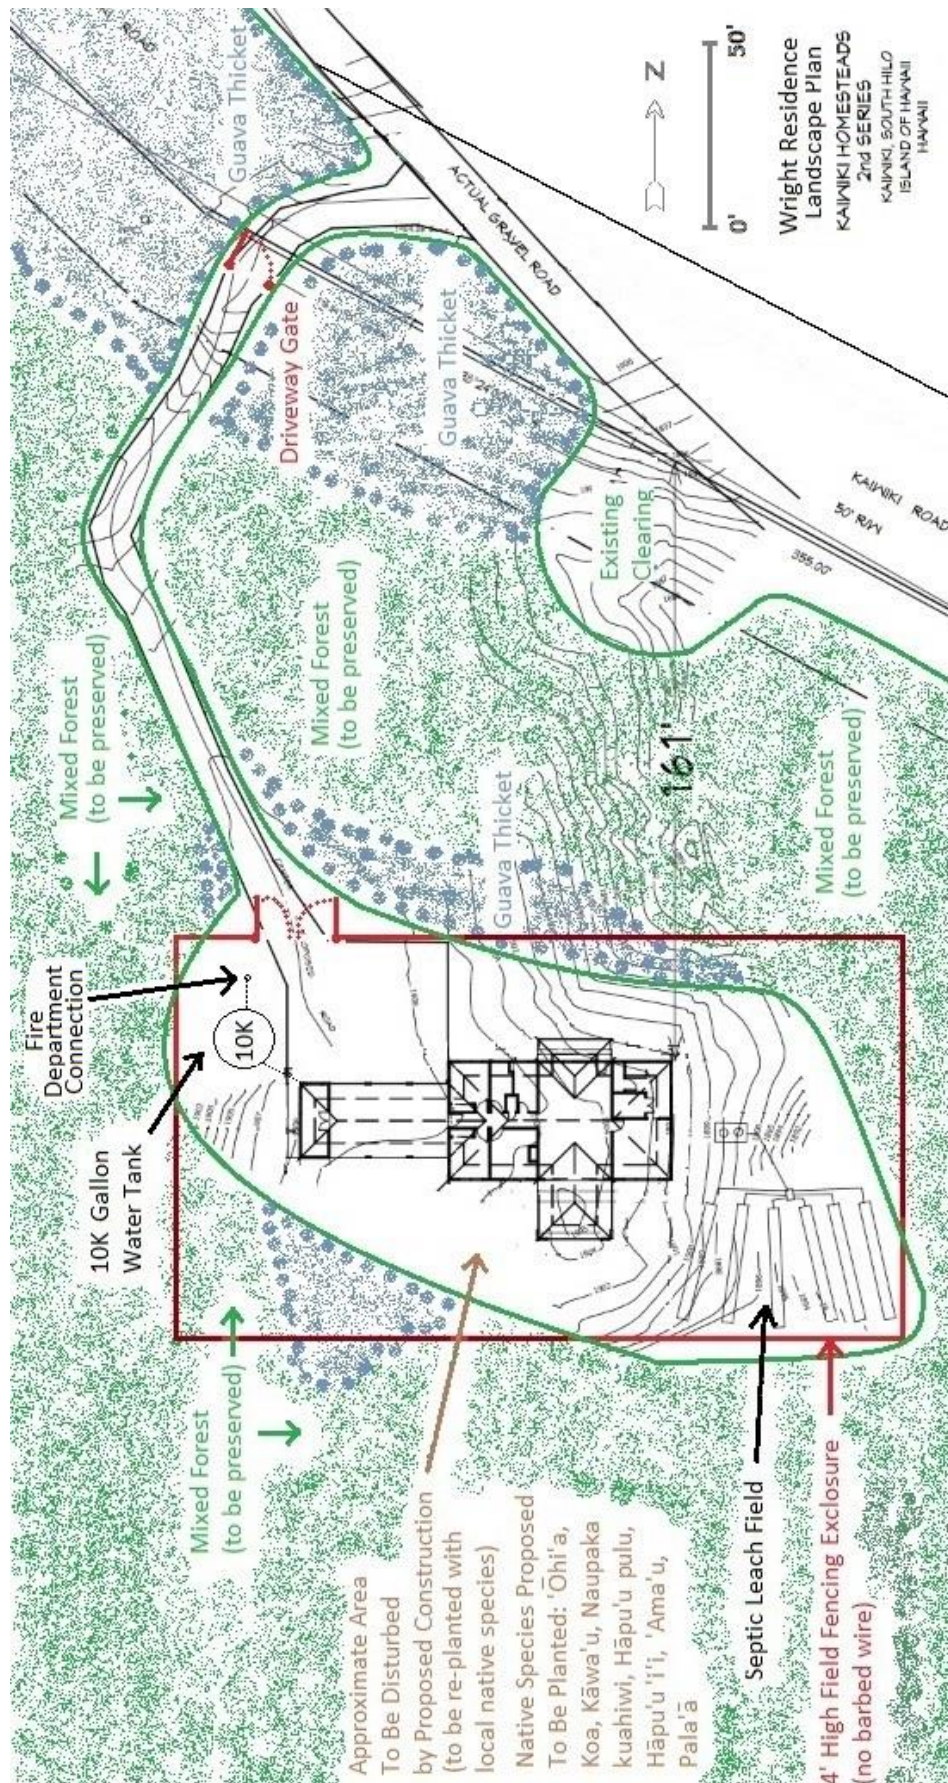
E. Proposed Wright/Bentley residence landscape plan.
